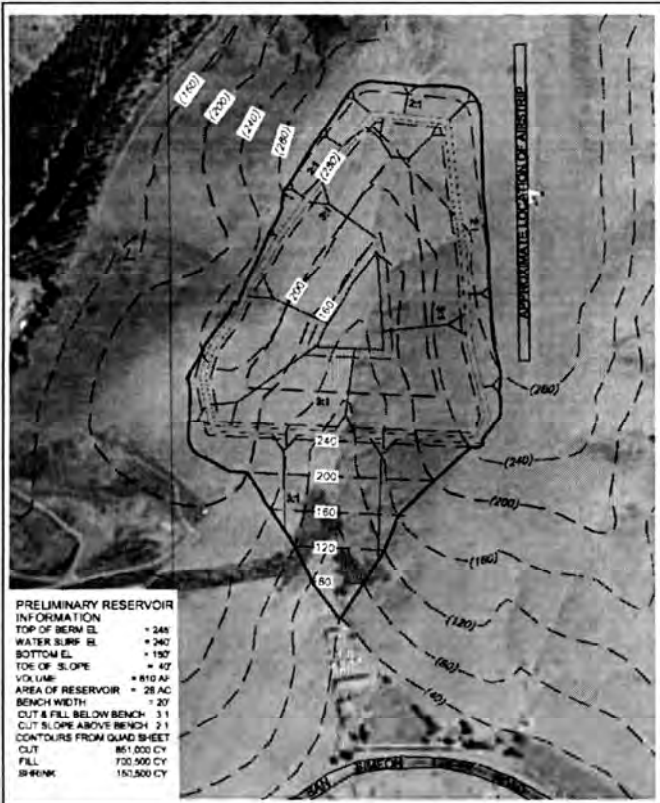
With the water surface at an elevation of 255 feet, this is about 215 feet above the yard.
